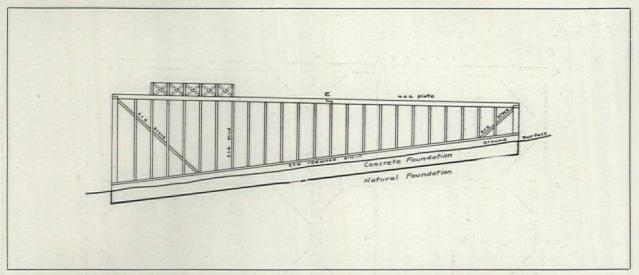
Poorly Braced Underpinning on Sloping Foundation, without Anchor Bolts
